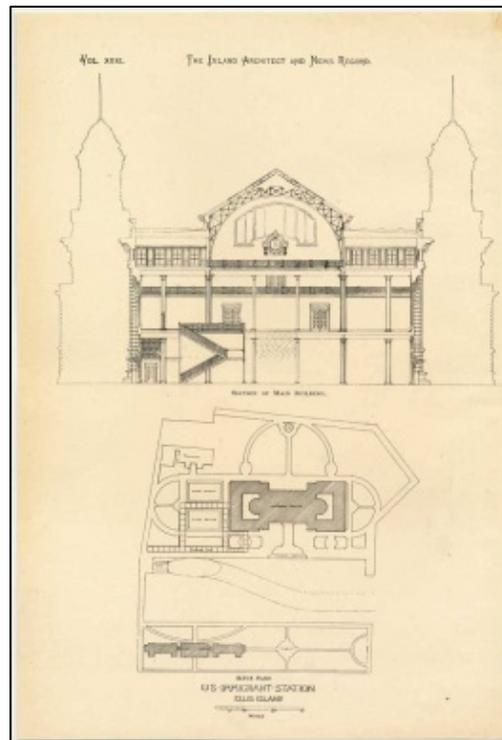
This image shows the original site plans proposed by Boring & Tilton in 1898.
